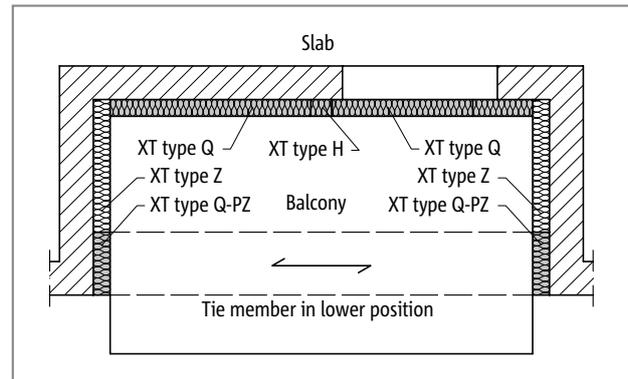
Schöck Isokorb® XT type Q, Q-PZ: Recessed balcony, supported on three sides - symmetric with tie member
